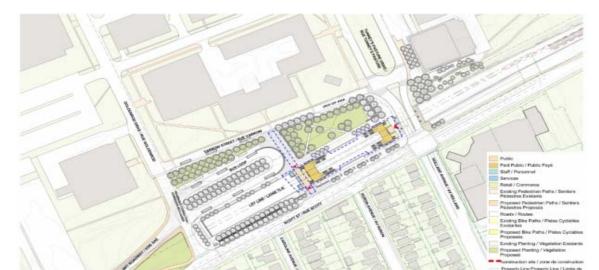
Plan for Tunney's Pasture Station (Source: Rail Implementation Office, 2011)
